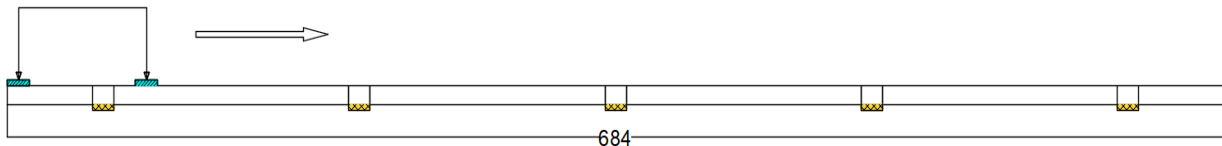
The placement of HL-93 load on the deck slab with 12 ft girder spacing (first combination)
